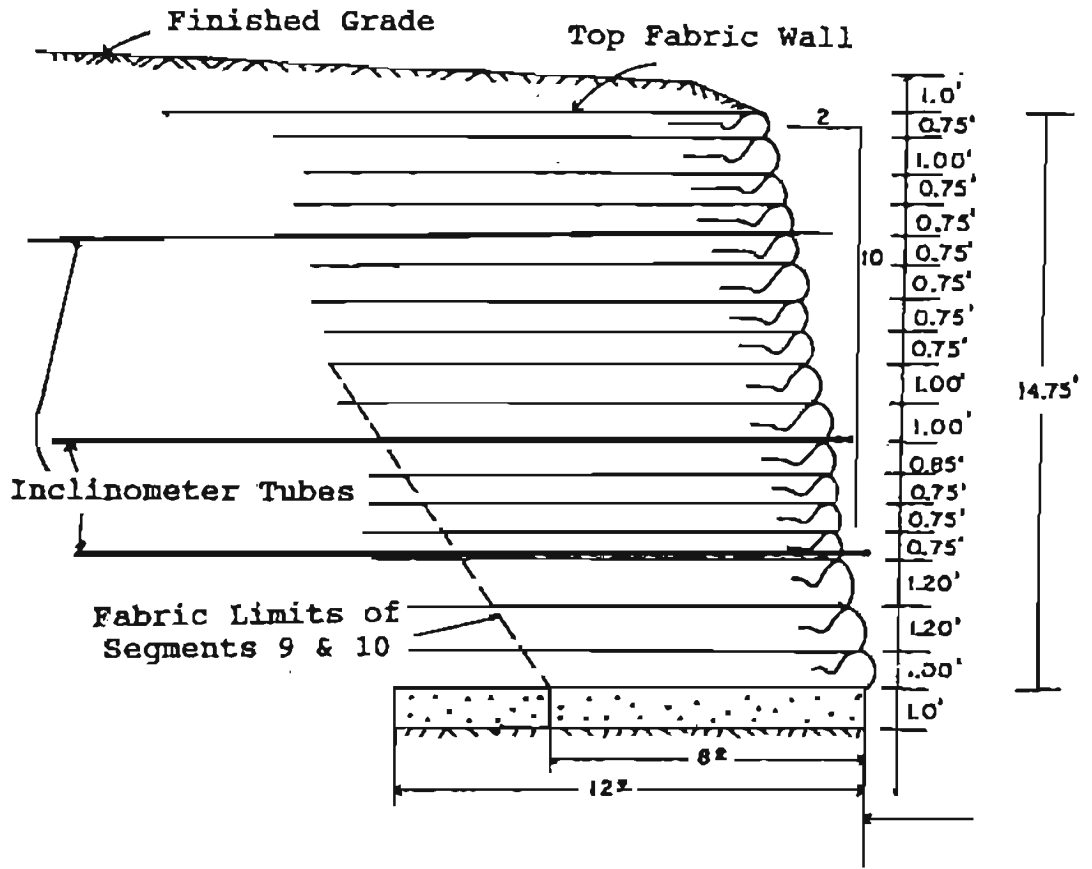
A Section of the Glenwood Canyon Geotextile Test Wall.
